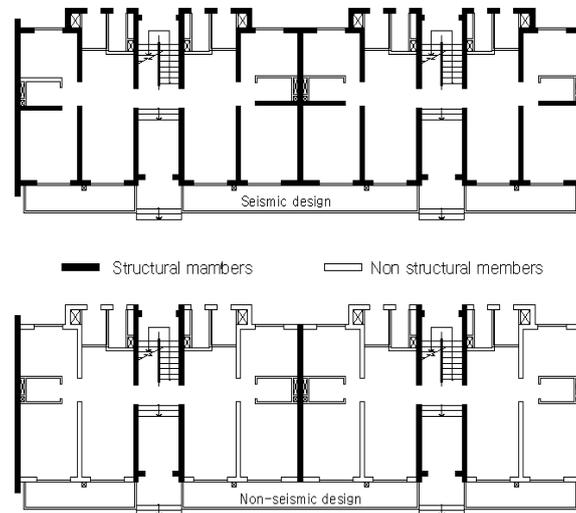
Seismic and non seismic designed on wall-type apartment building
